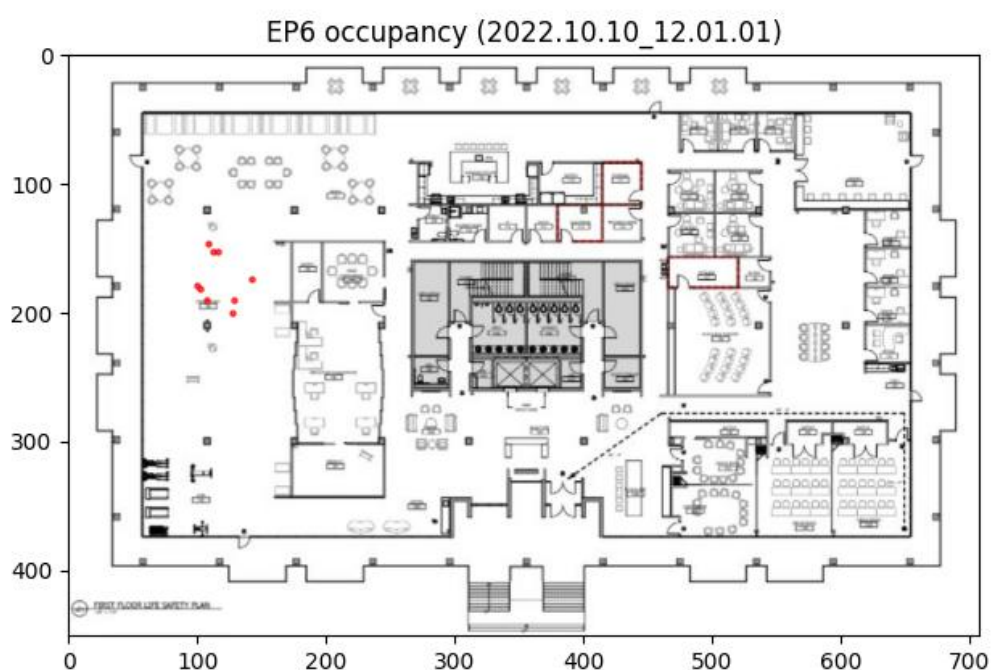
Location of individuals (red dots) within floor plan layout of the built environment
